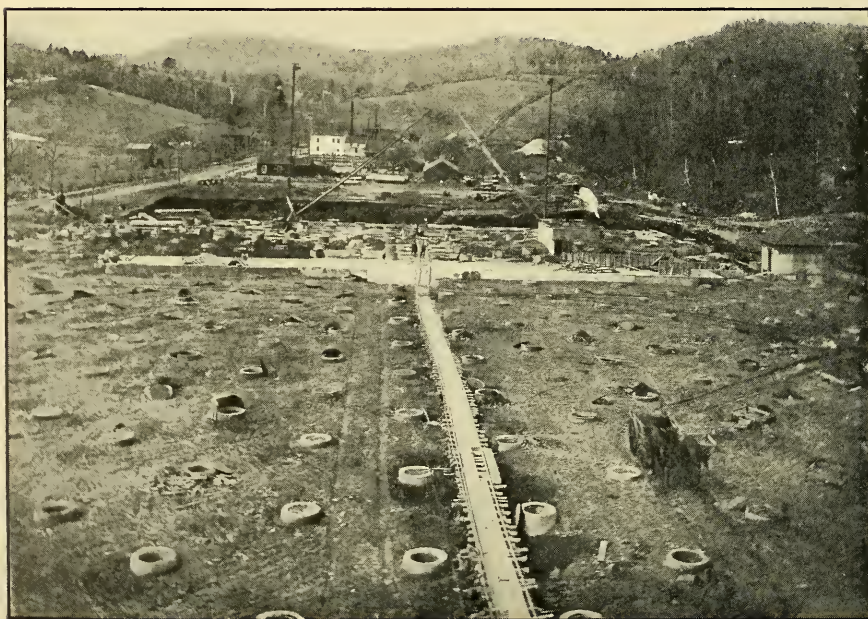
VIEW SHOWING DERRICKS FOR HANDLING CONCRETE.
